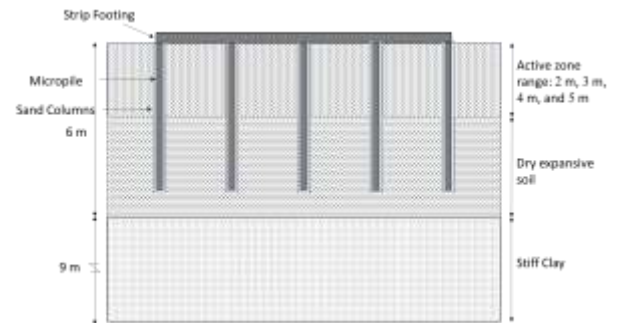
Typical geometry of strip footing supported by micropiles surrounded by sand.
